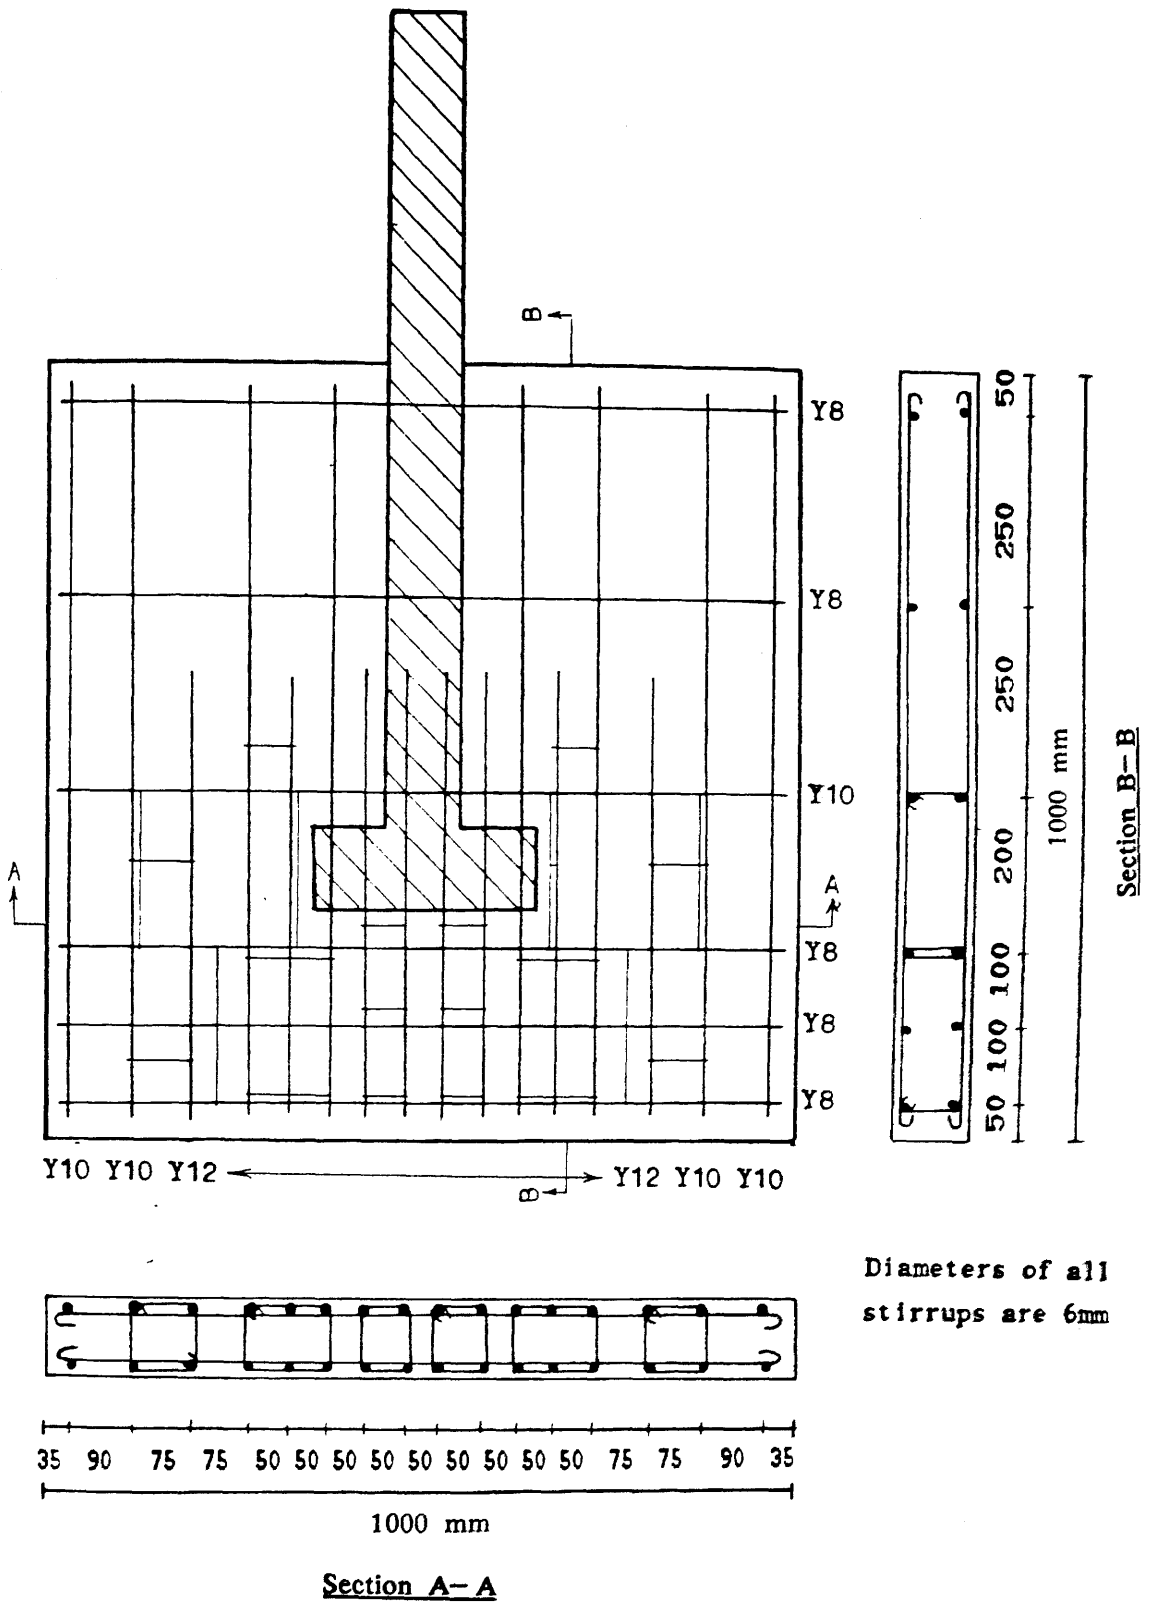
Arrangement of top and bottom reinforcing bars including closed vertical stirrup in the slab of model MRS13 (top and bottom steel bars are identical)
